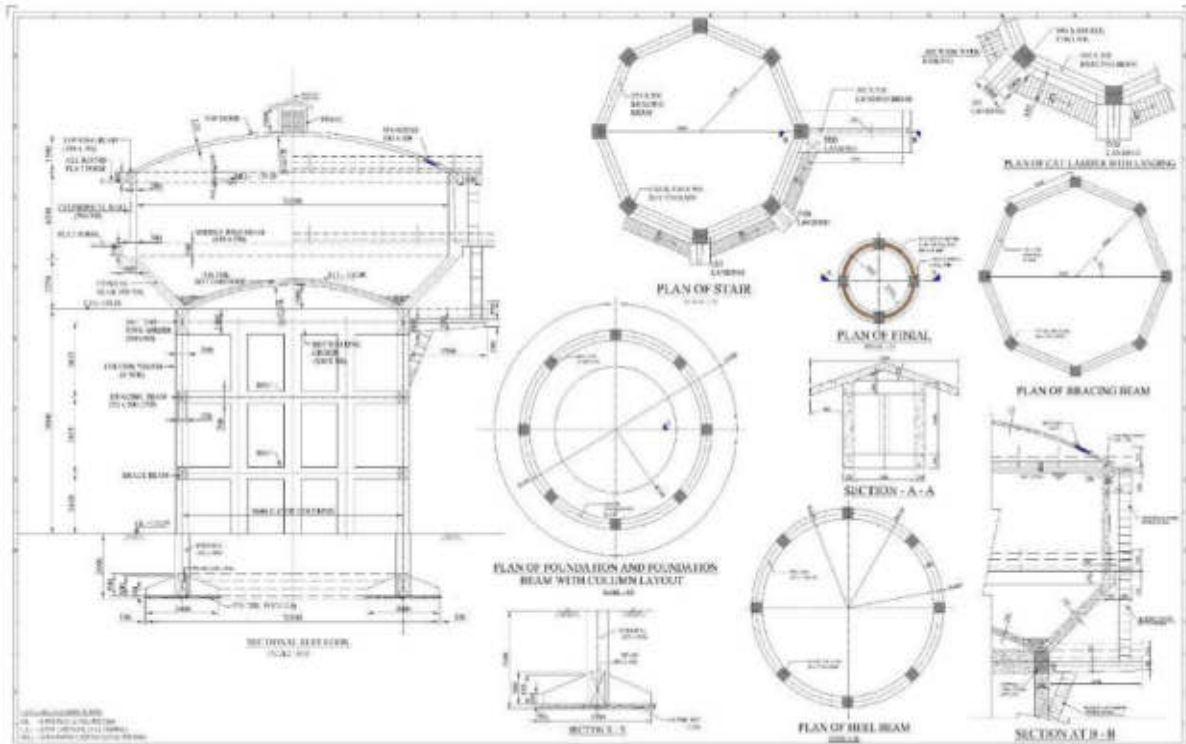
Proposed Layout Plan of OHT at Kabaka zone-5
